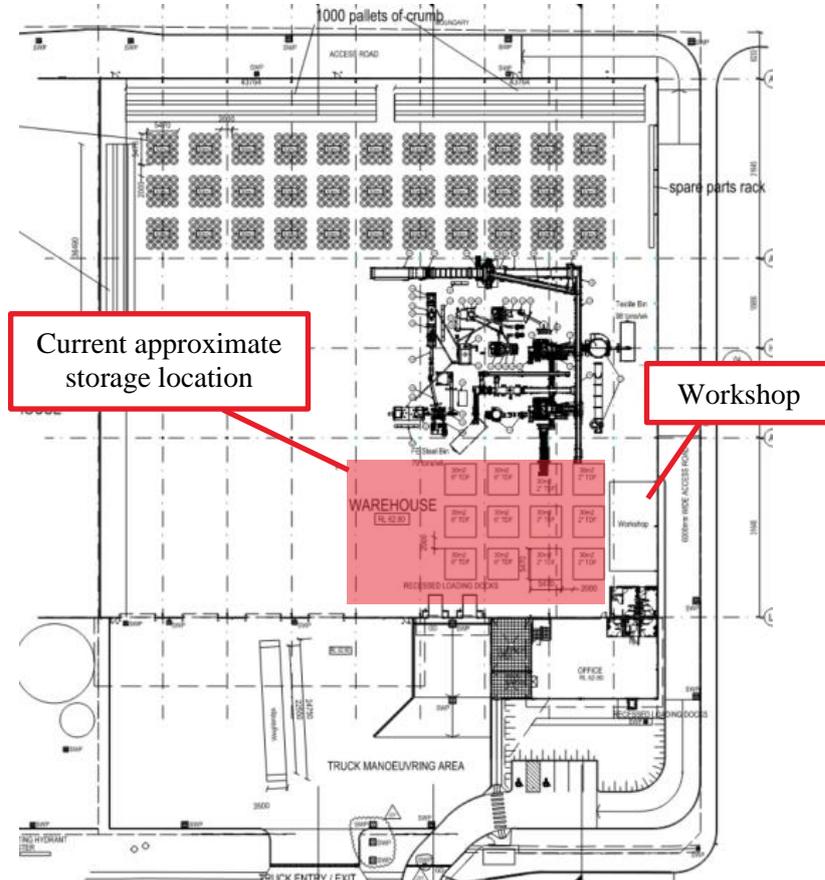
Current Site Layout – Location of TDF Pile / Granule Bag storage
